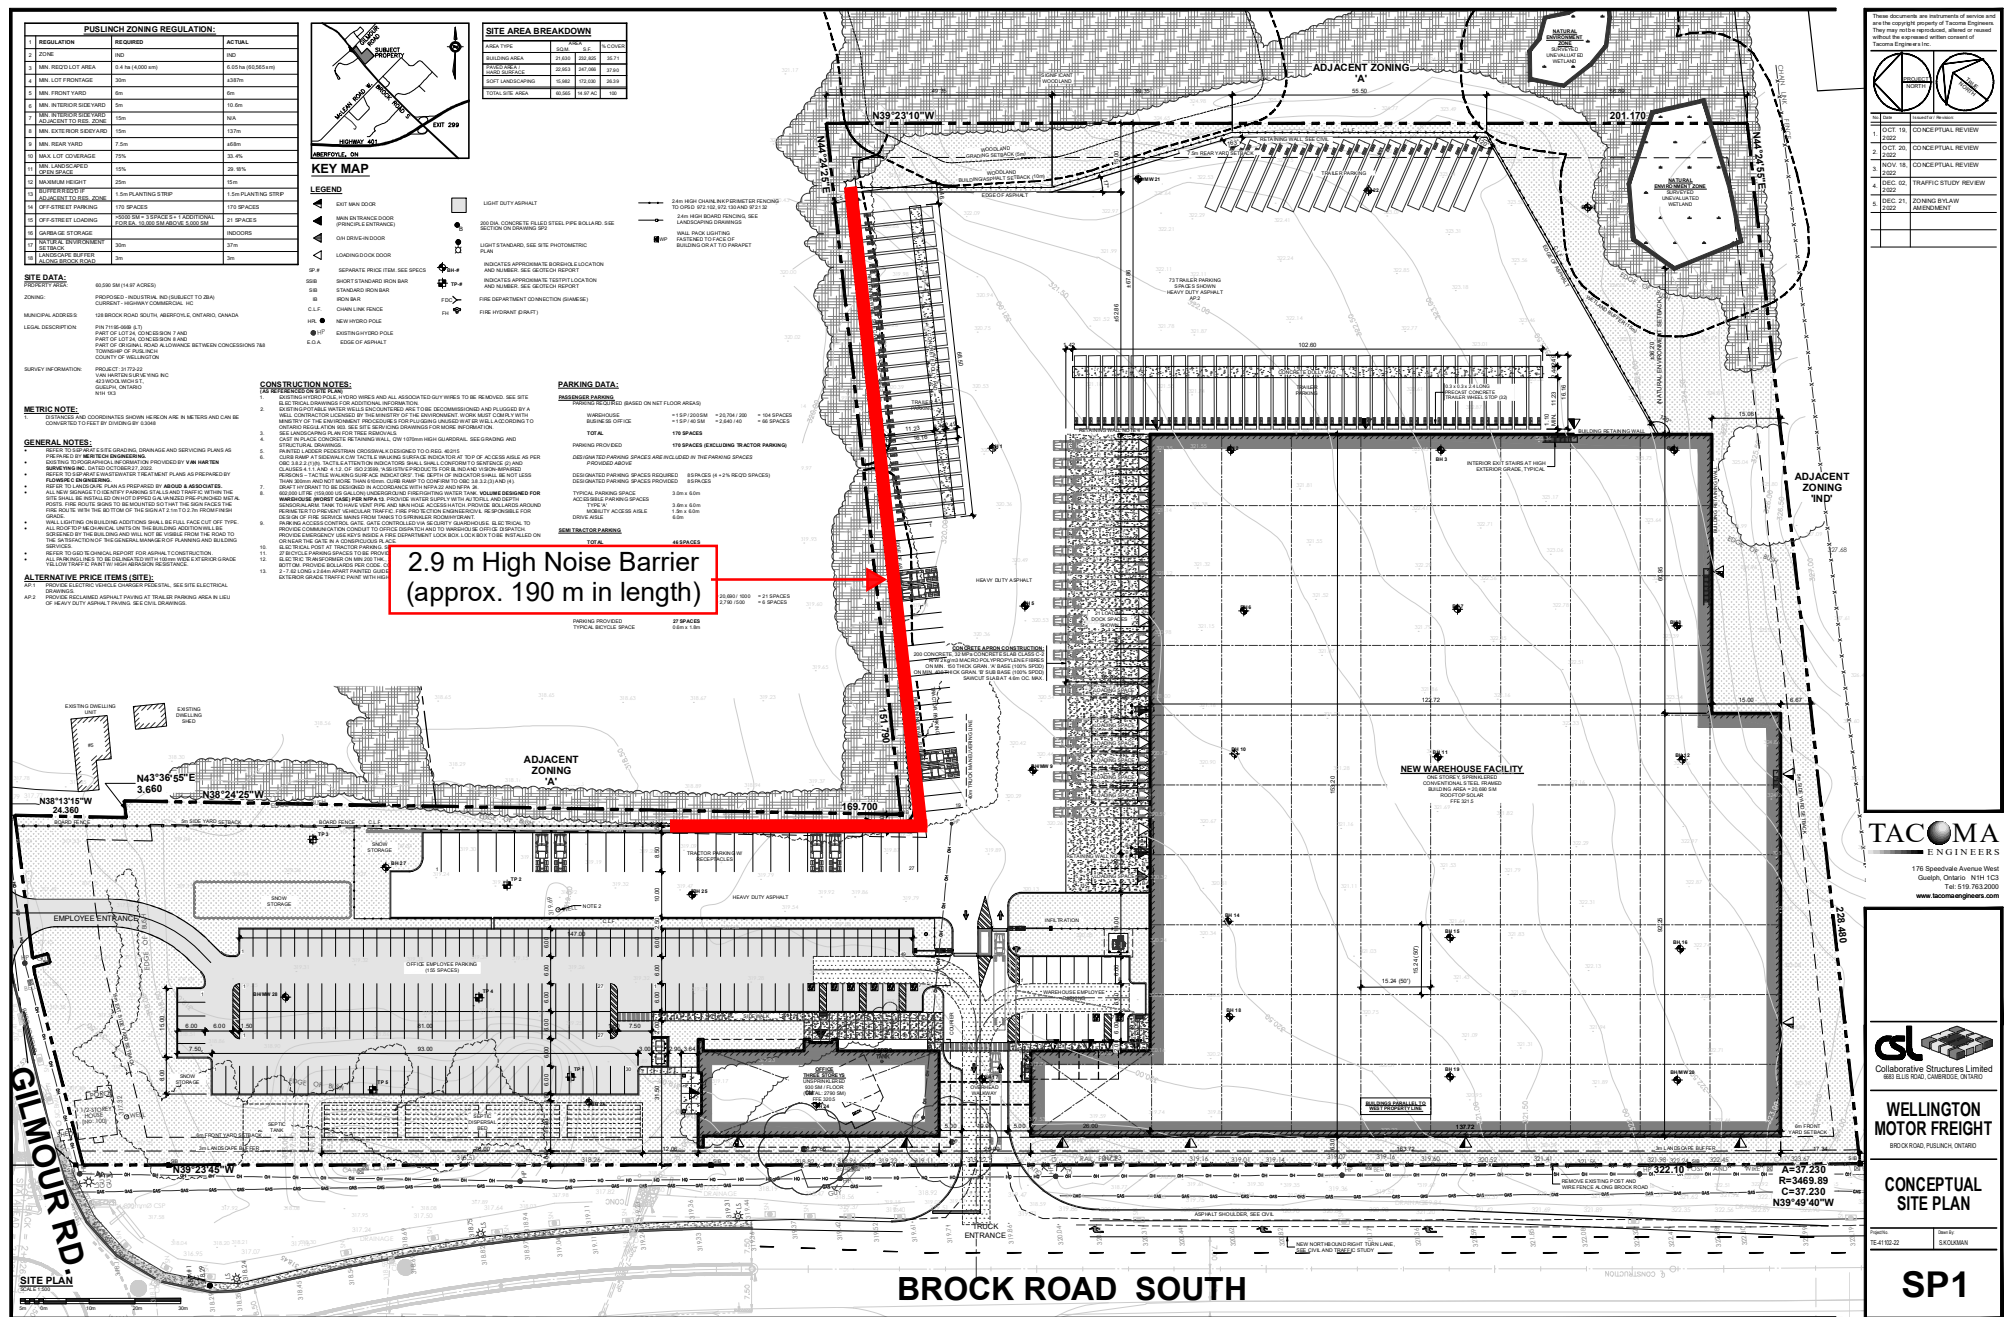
Proposed Site Plan Showing Noise Barrier Location
